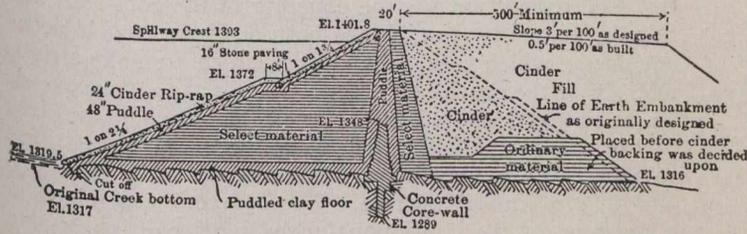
Maximum Cross Section of Hinckston Run Dam.
